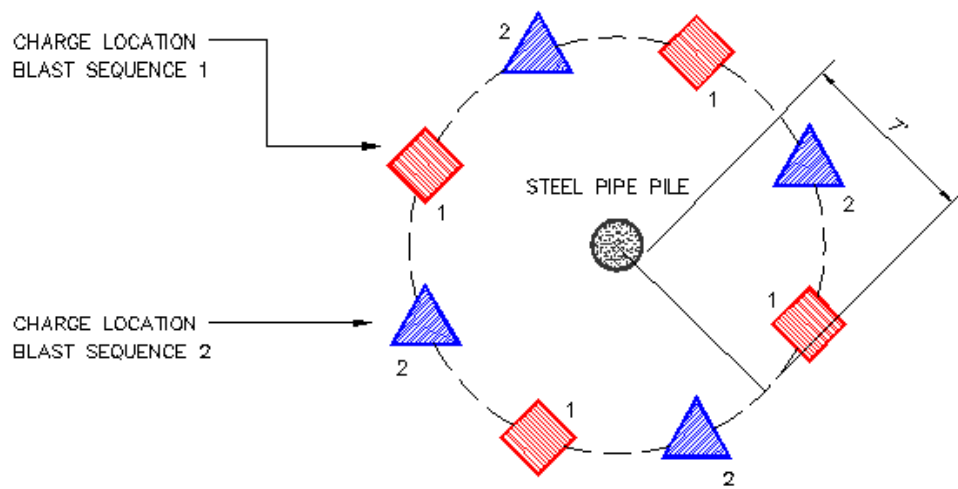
Detonation Sequence used for BIL at NGES on Pile Load Tests
